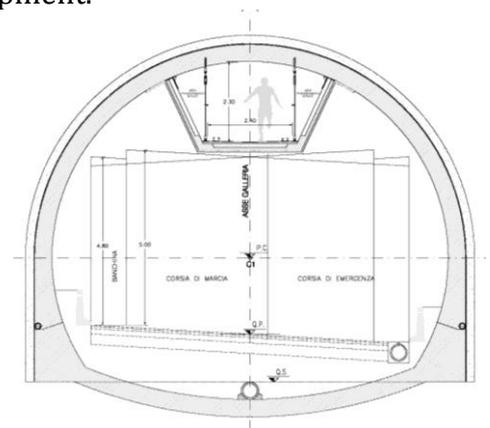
Suspended Escape route within the cross section of Macina tunnel (Carrara)
